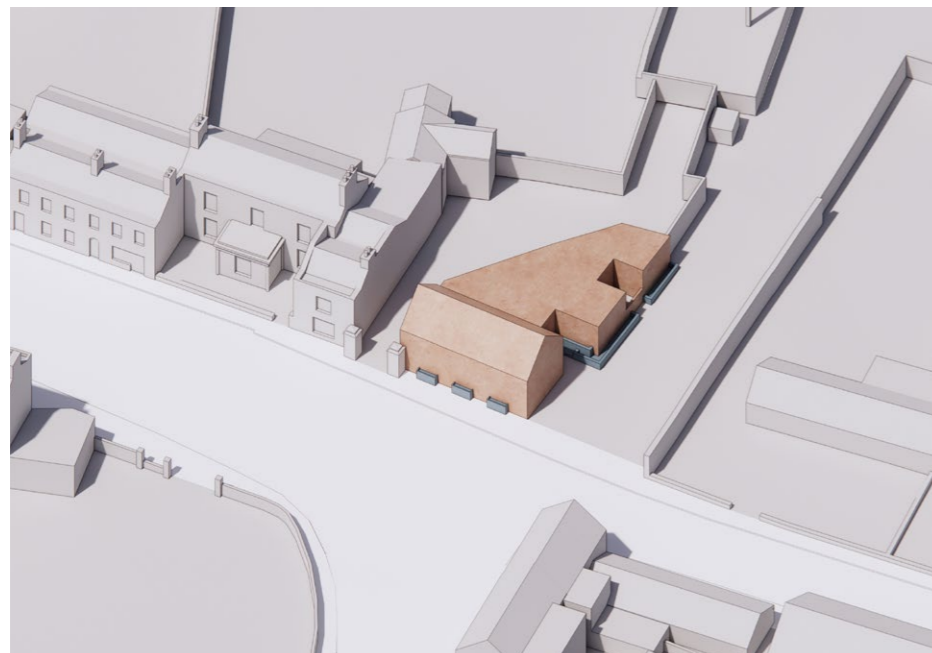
Built-in planters and seats surround the volumes, providing privacy and amenity to the apartment and activating the public space.
